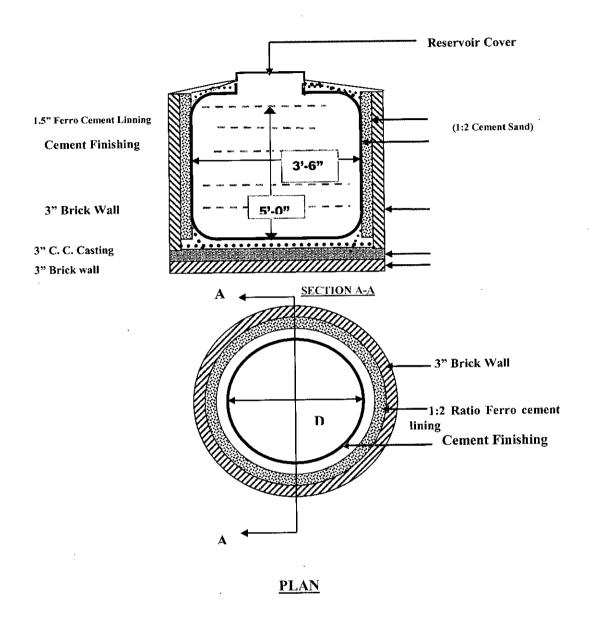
Plan and Section of Underground Water Reservoir (Water Point).
